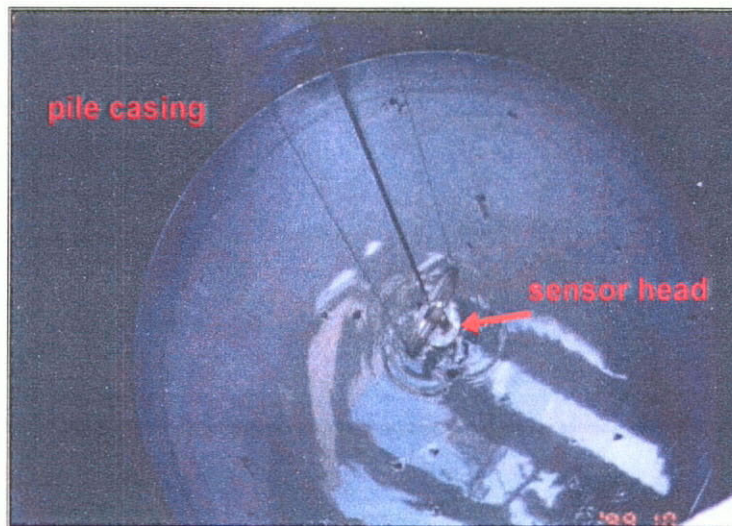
Lowering the sensor head of the UES equipment into a water-filled shaft
